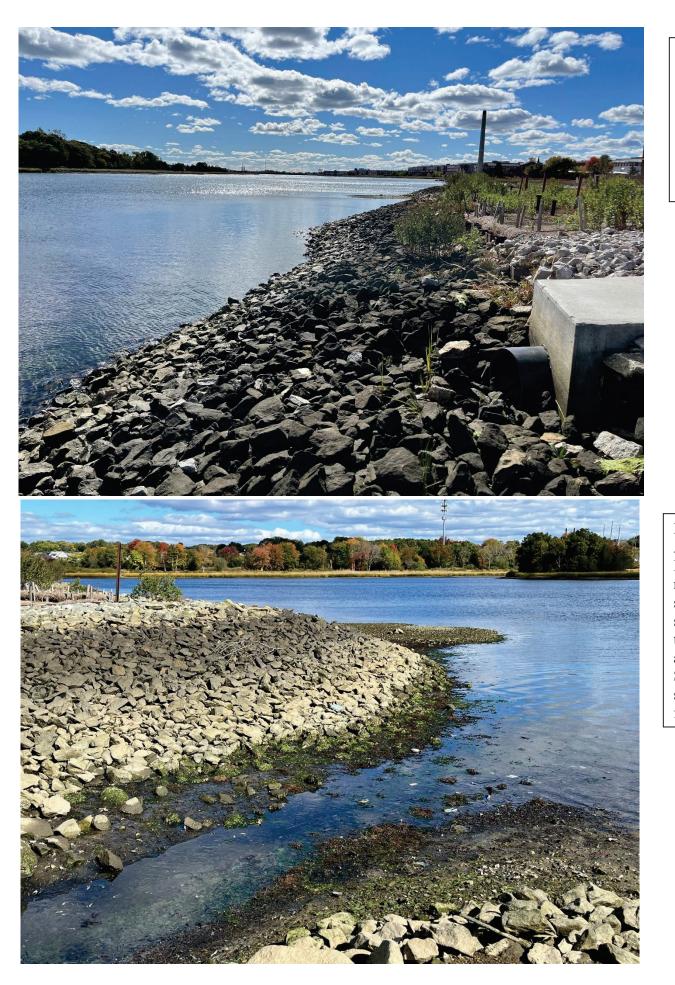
Aerovox Cap: Looking south showing the South Trench storm drain outlet in the foreground.
